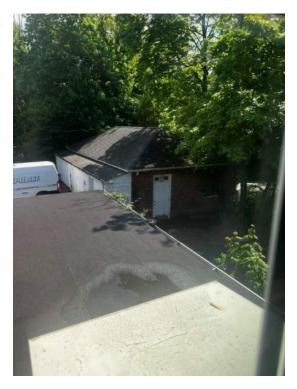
IMG_1517 – Flat roof over rear – exhibits significant ponding on Northwest corner of roof; aligning with deteriorated wall and ceiling of Prep Room below.
